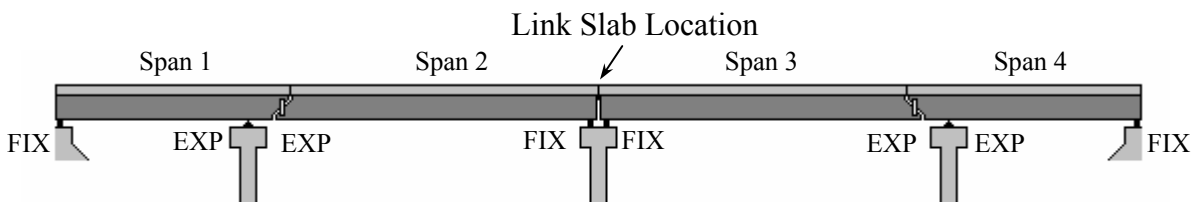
Schematic of link slab on westbound I-496 near Lansing, Michigan.
